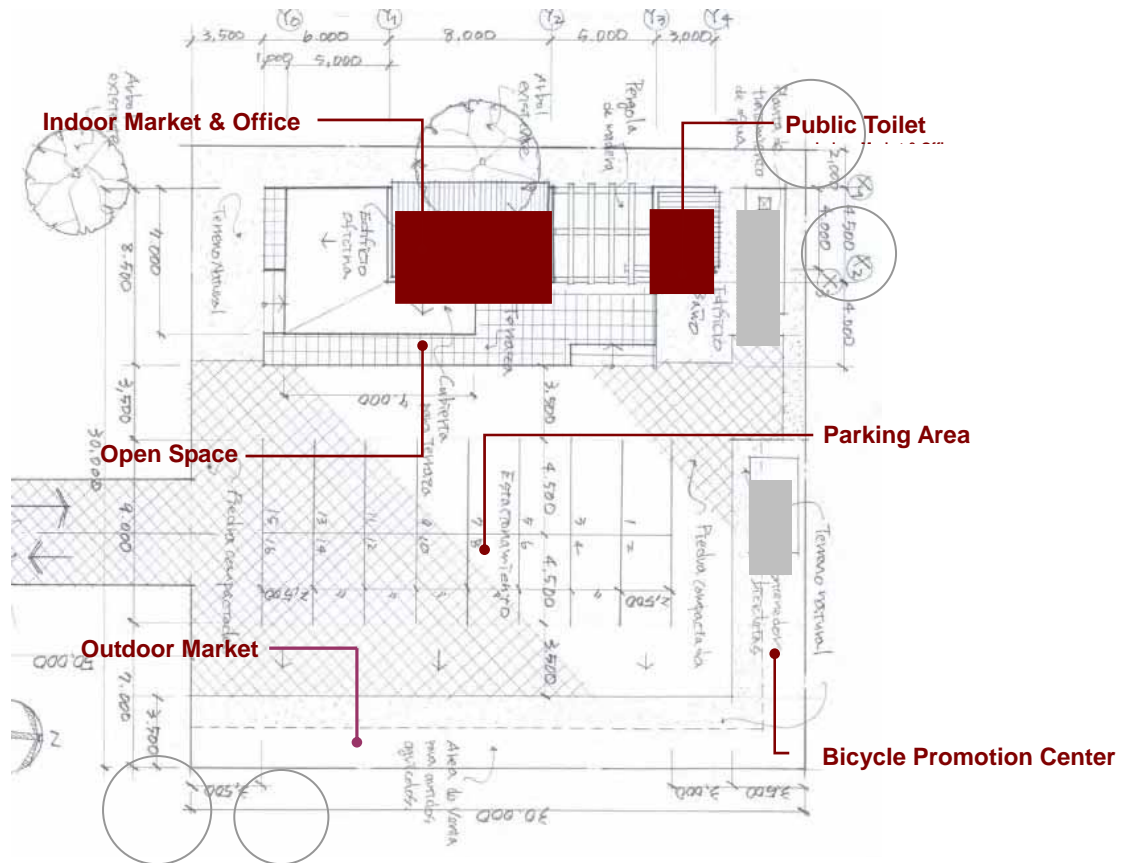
Site and Facility Layout Plan (prepared by the Study Team)
